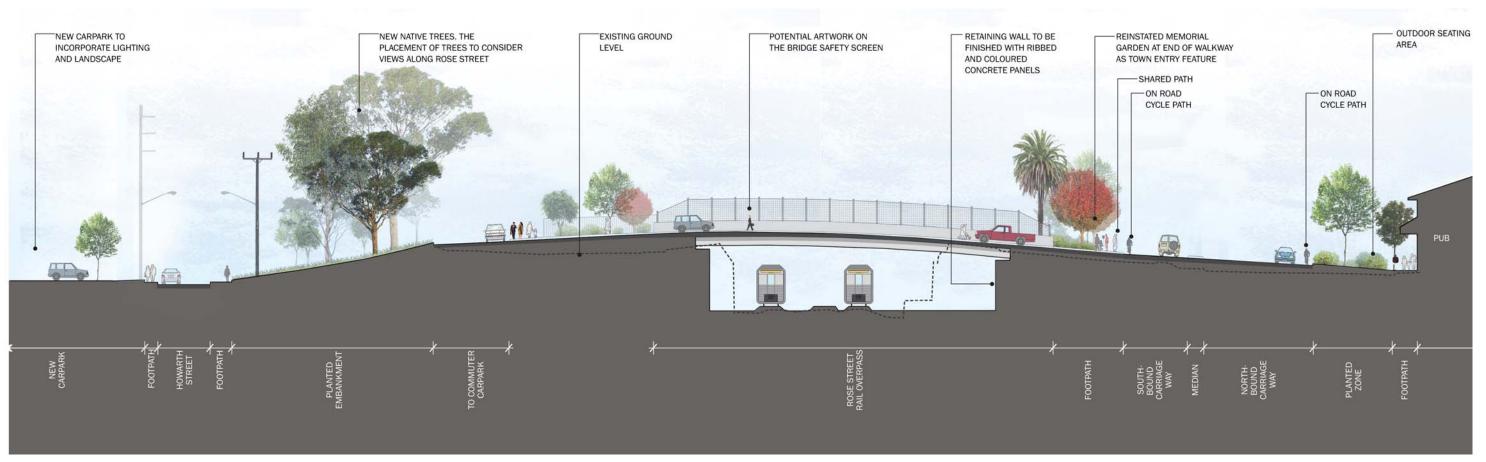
Proposed road cross section D at Ch. 1280 (Scale 1:400 @ A3)
